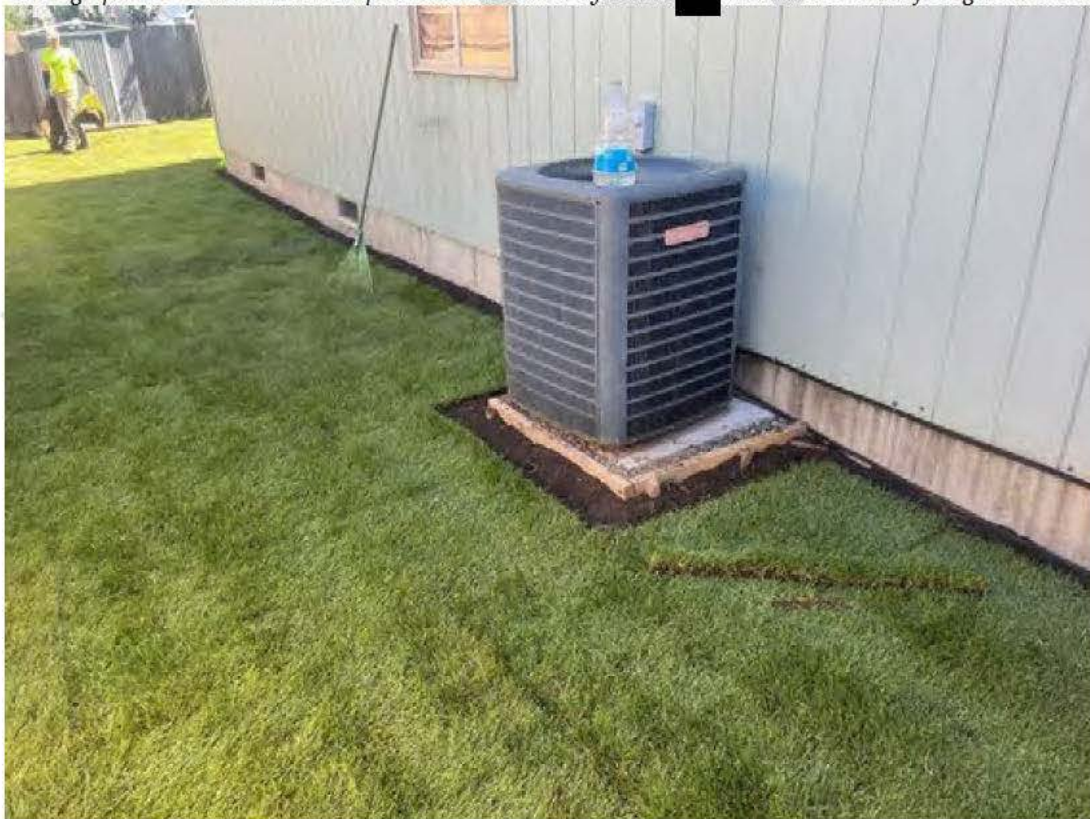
Toposil placed around back porch at [REDACTED] Baxter. Photo taken facing southwest.
